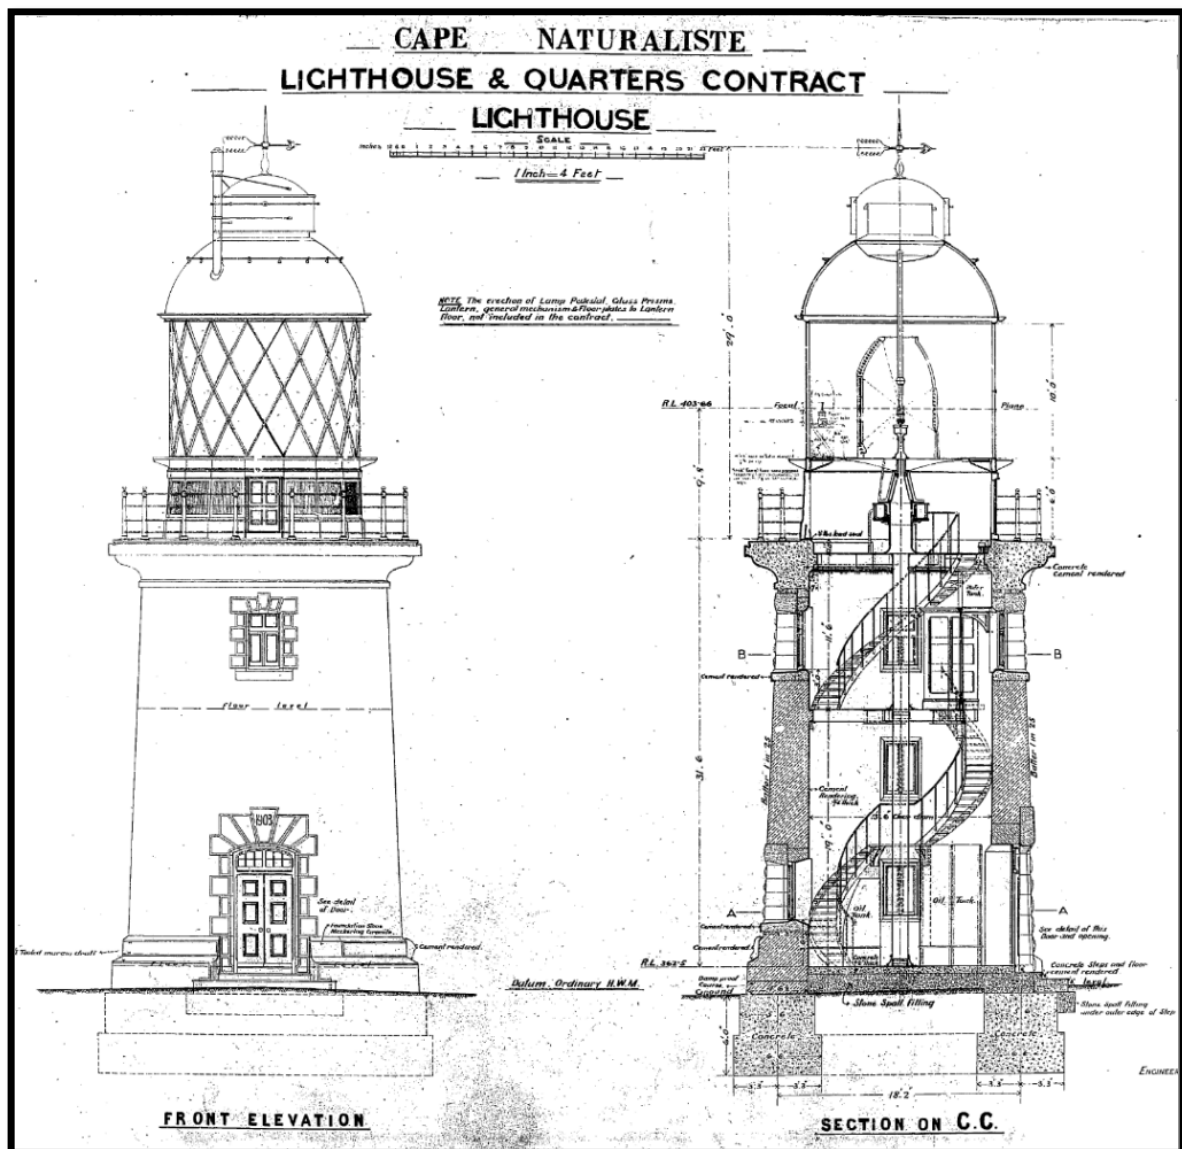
Elevation drawing of the Cape Naturalist Lighthouse
